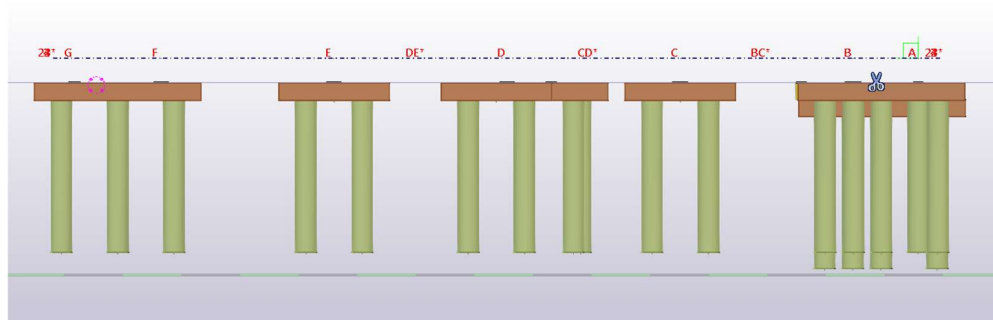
7 Concrete Model of the Bore Pile and Pile Cap
